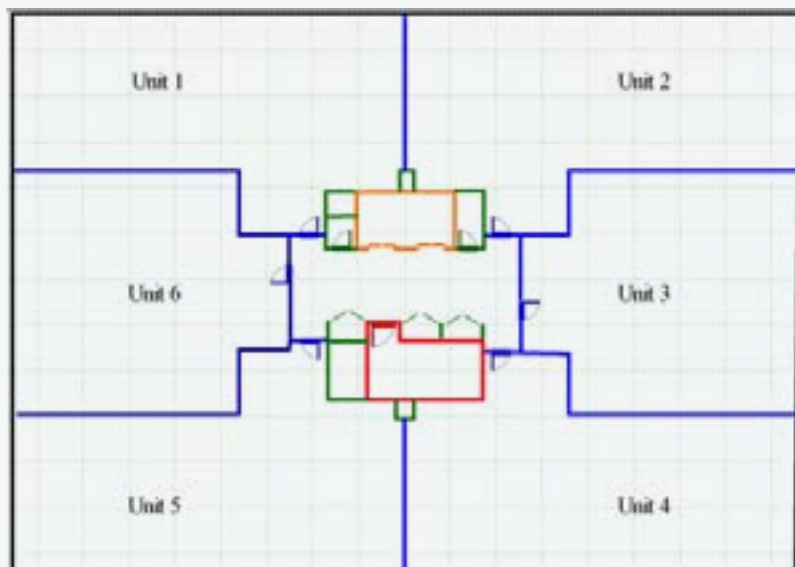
Horizontal section through typical upper floor of generic Class 2/3 or 5 building.
